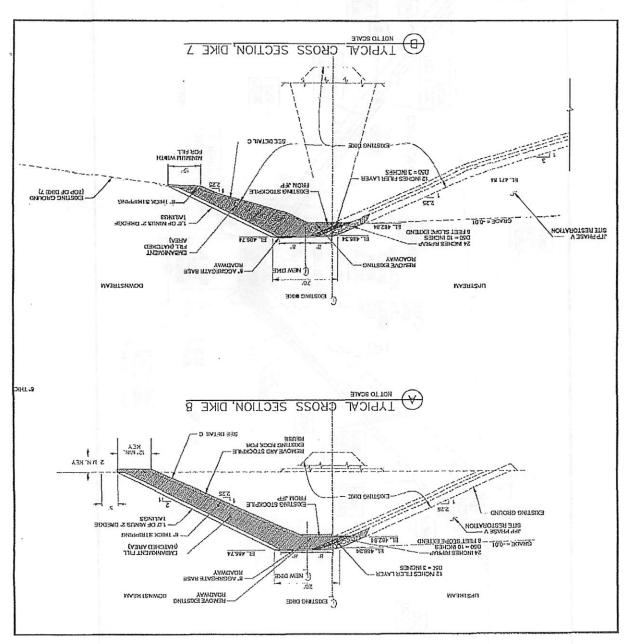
Preliminary typical cross sections for 3.5-foot raise of Dike 7 and Dike 8.
